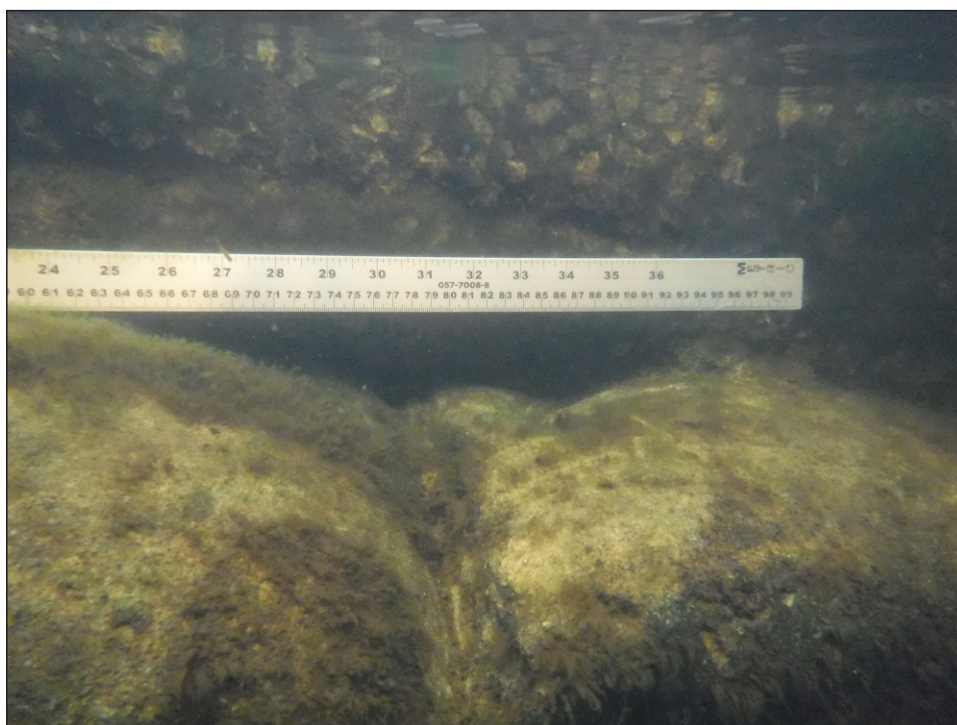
Interface between grout bags and concrete cap at surface, East Pier
